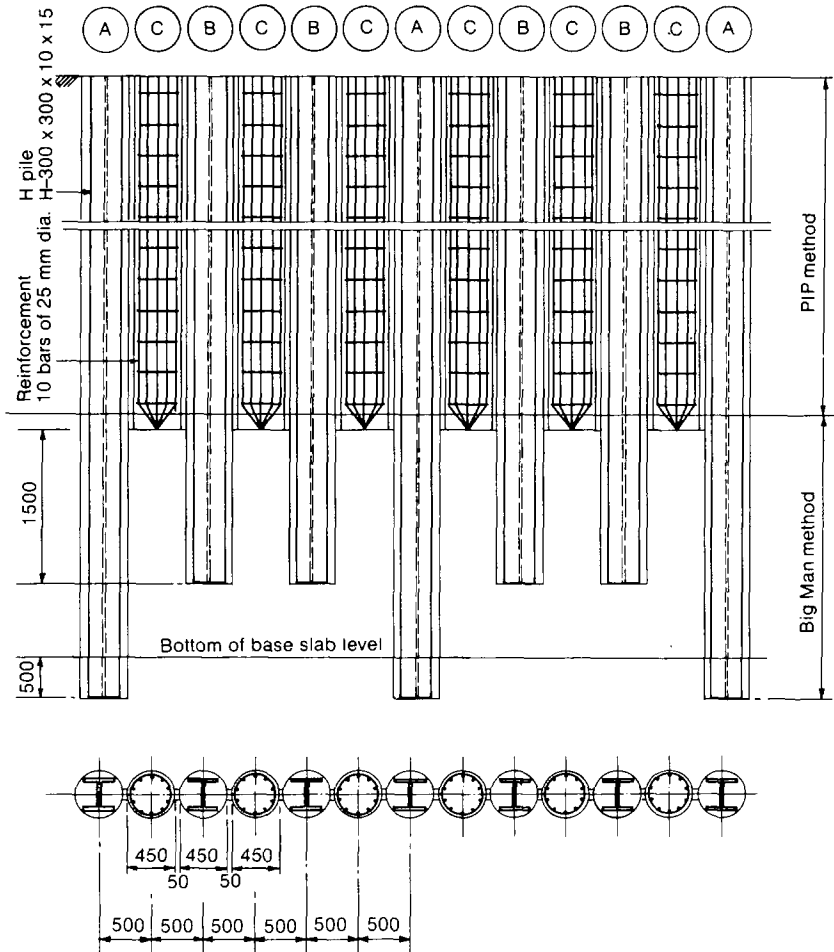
PIP-W piling walls with A, B and C piles (dimensions in millimetres)
